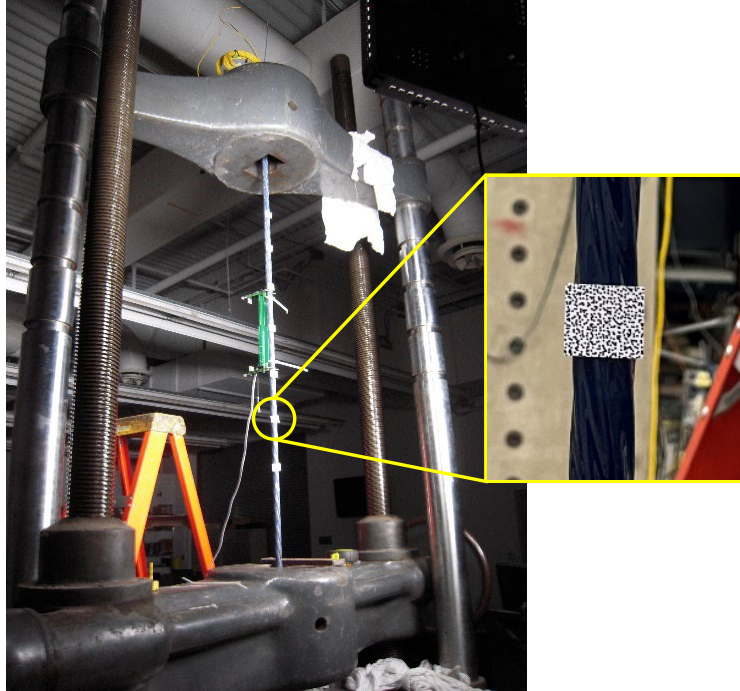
Strand specimen installed in universal testing machine for elastic modulus test.
